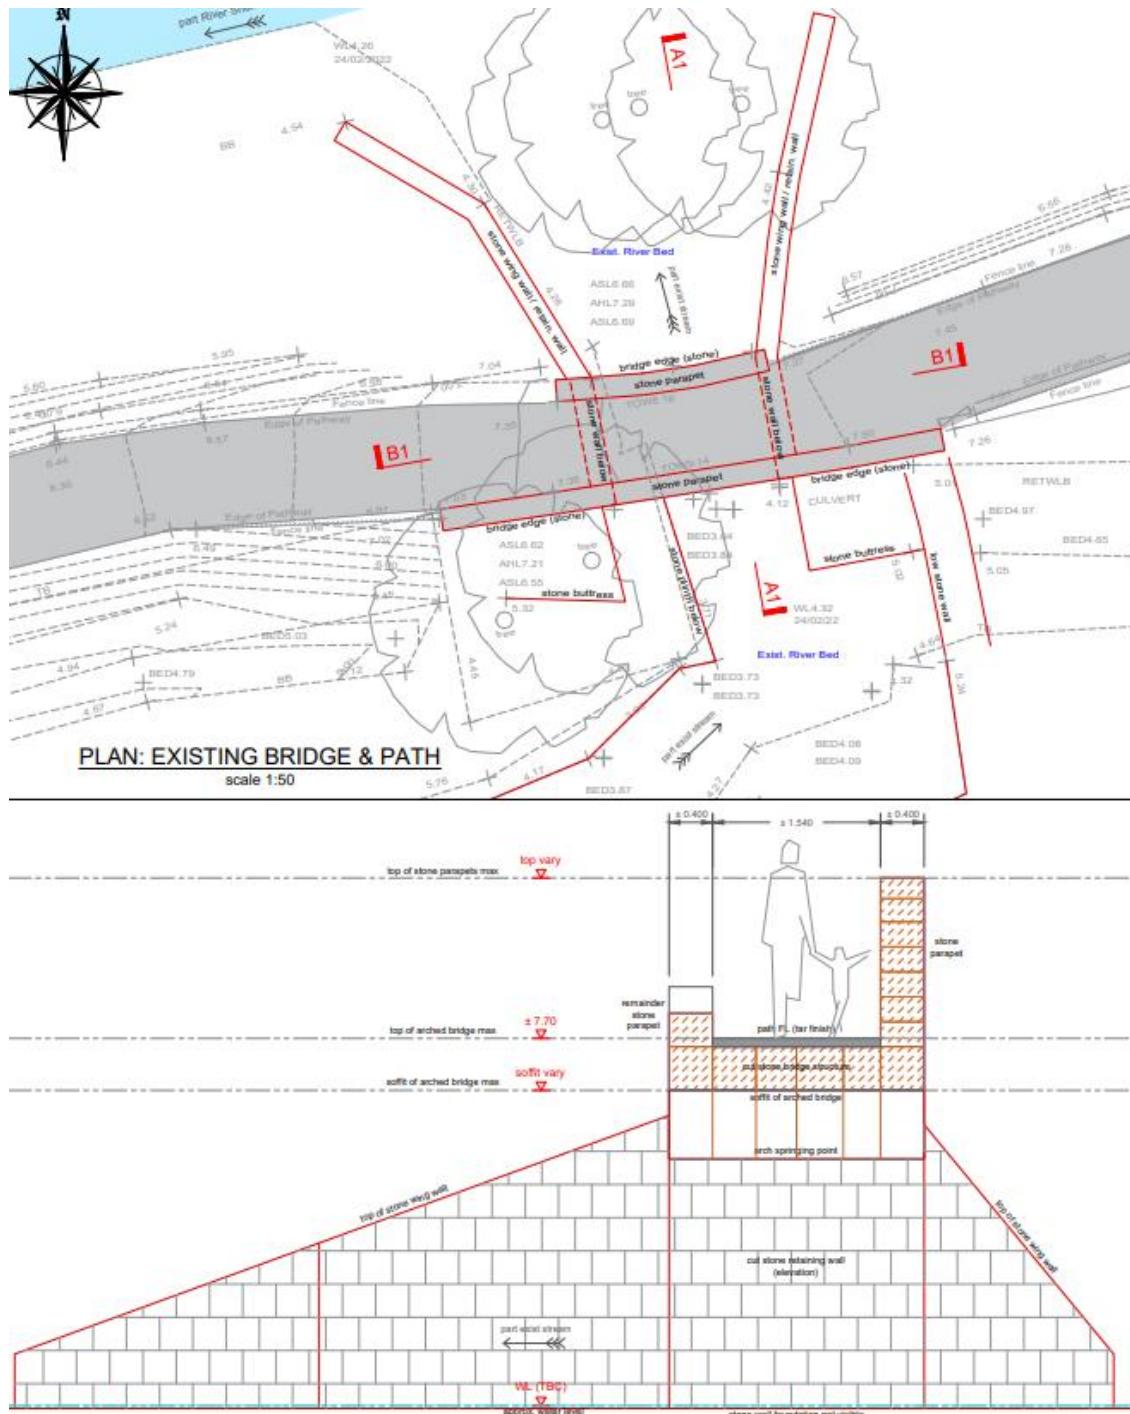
Existing plan and section for Bridge 2 (refer to drawing RHA-XX-DR-S-SPO020)
